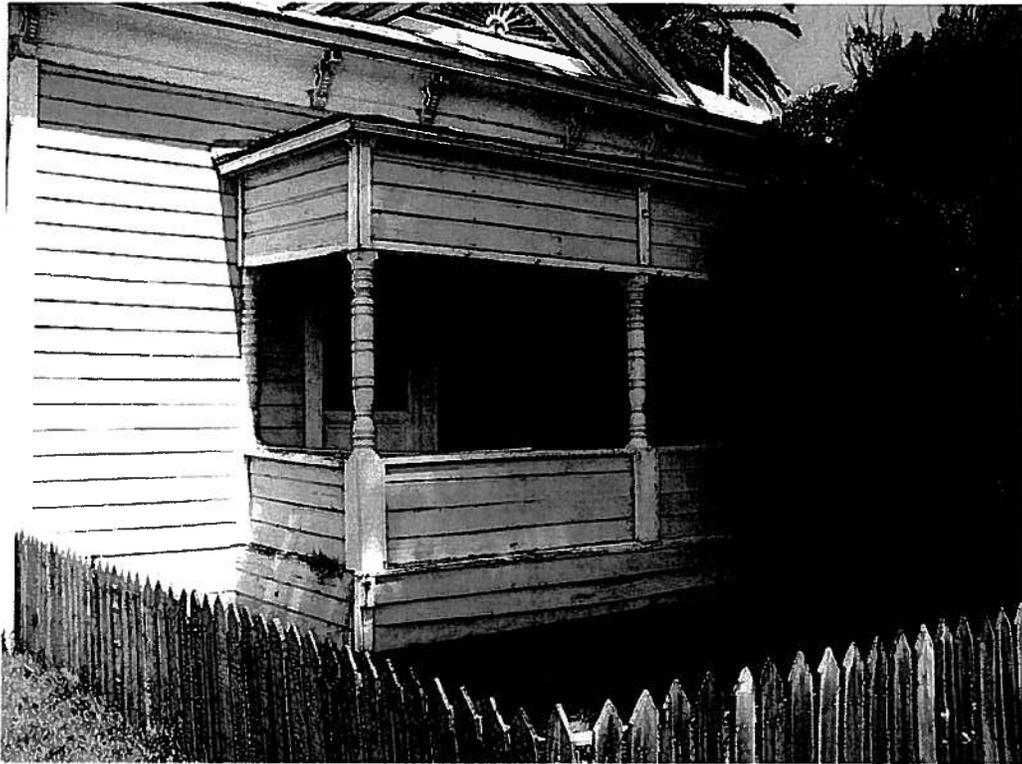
Detail of partially-enclosed porch on south façade, 102 North Pacific Street.
